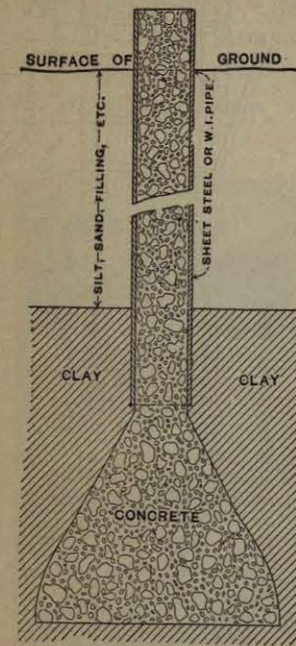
Concrete Pile with Enlarged Footing. (See p. 651.)
